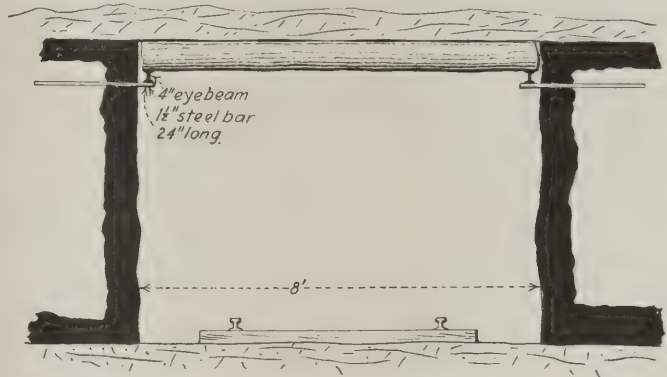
CROSSBAR RESTING ON EYEBEAM STRINGERS
